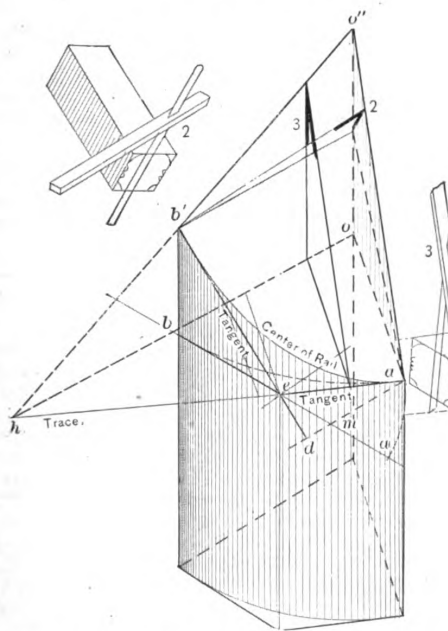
Isometric View of the Block Assumed in Figs. 1 and 2, Showing Plane of the Sectional Cut in Elevation to Plan of the Block.
